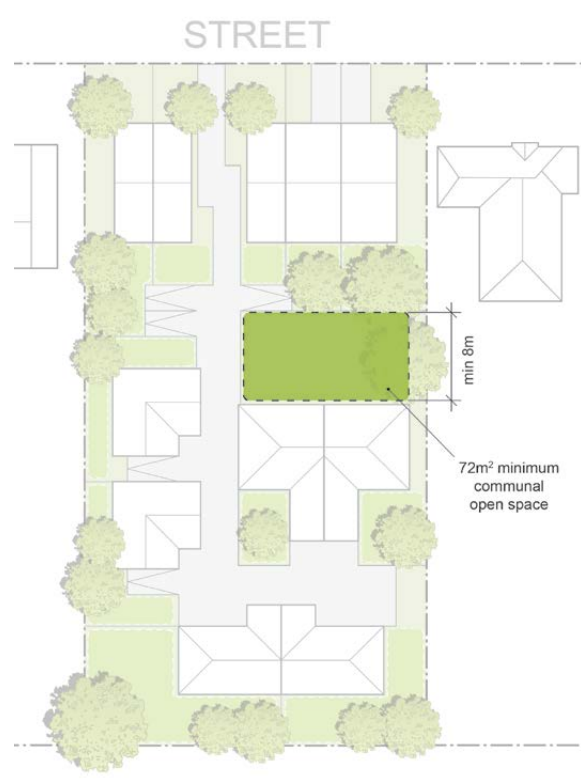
Communal open space should be provided where more than 10 dwellings are proposed
